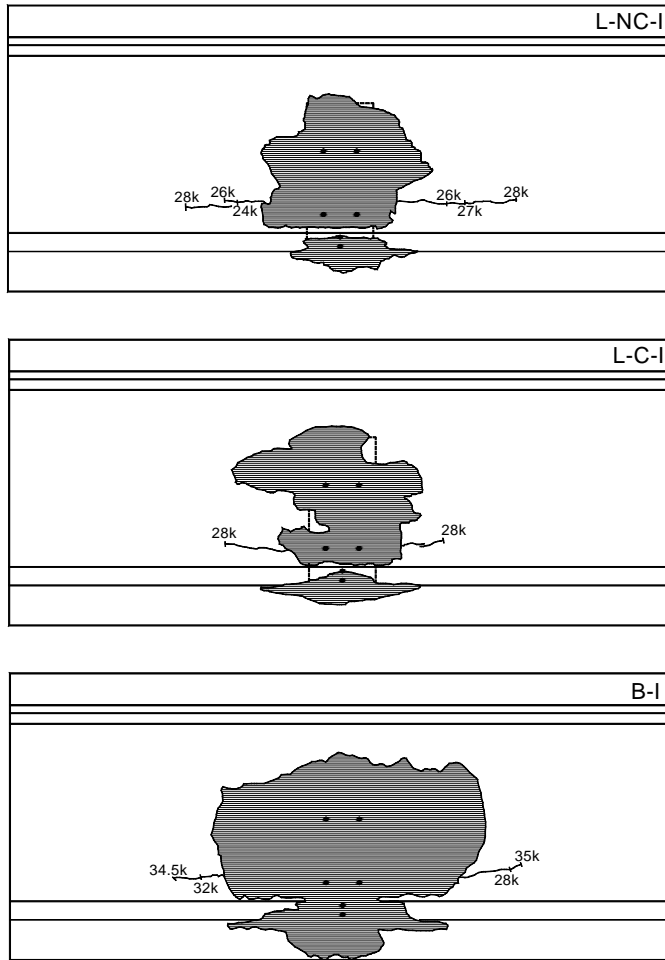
Concrete breakout and cracking pattern in inclined loading specimens.
